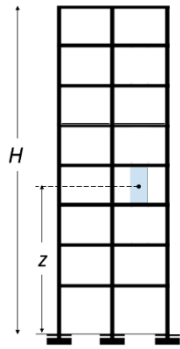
Structural model for out-of-plane tests on full-scale partition walls
